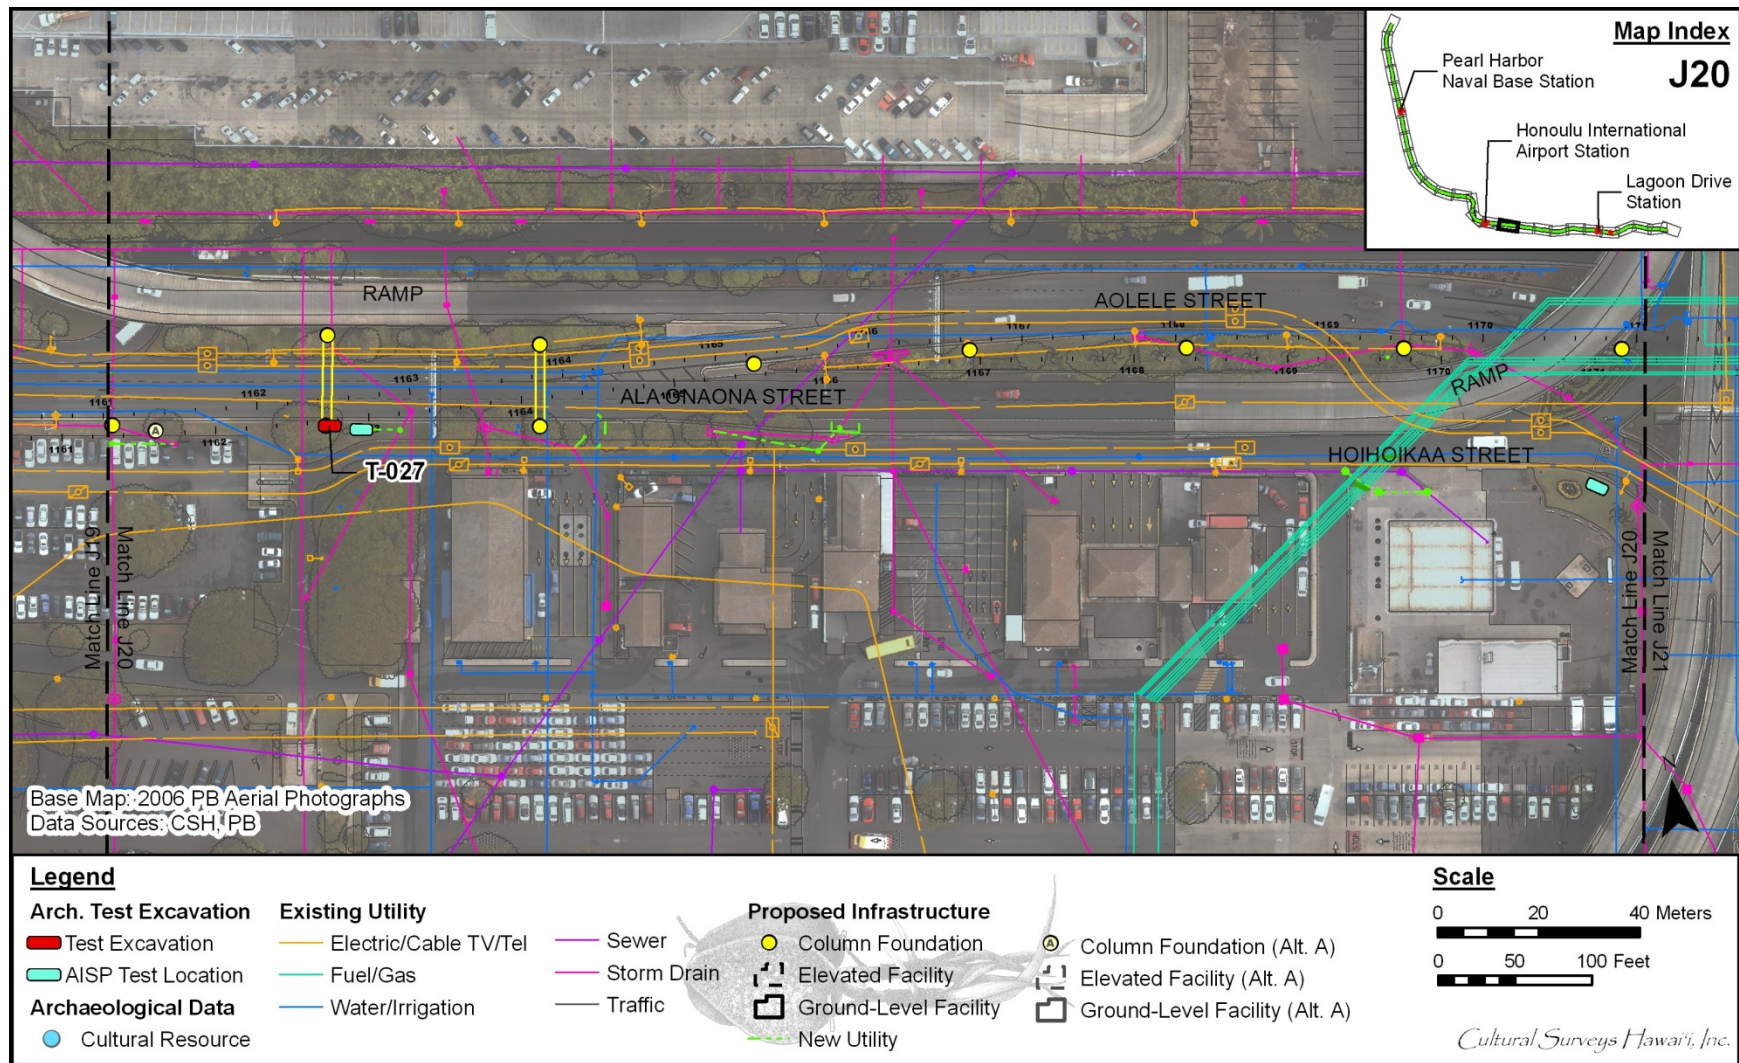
Map Sheet J20, one column foundation test excavation (T-027) @ 1151+60
